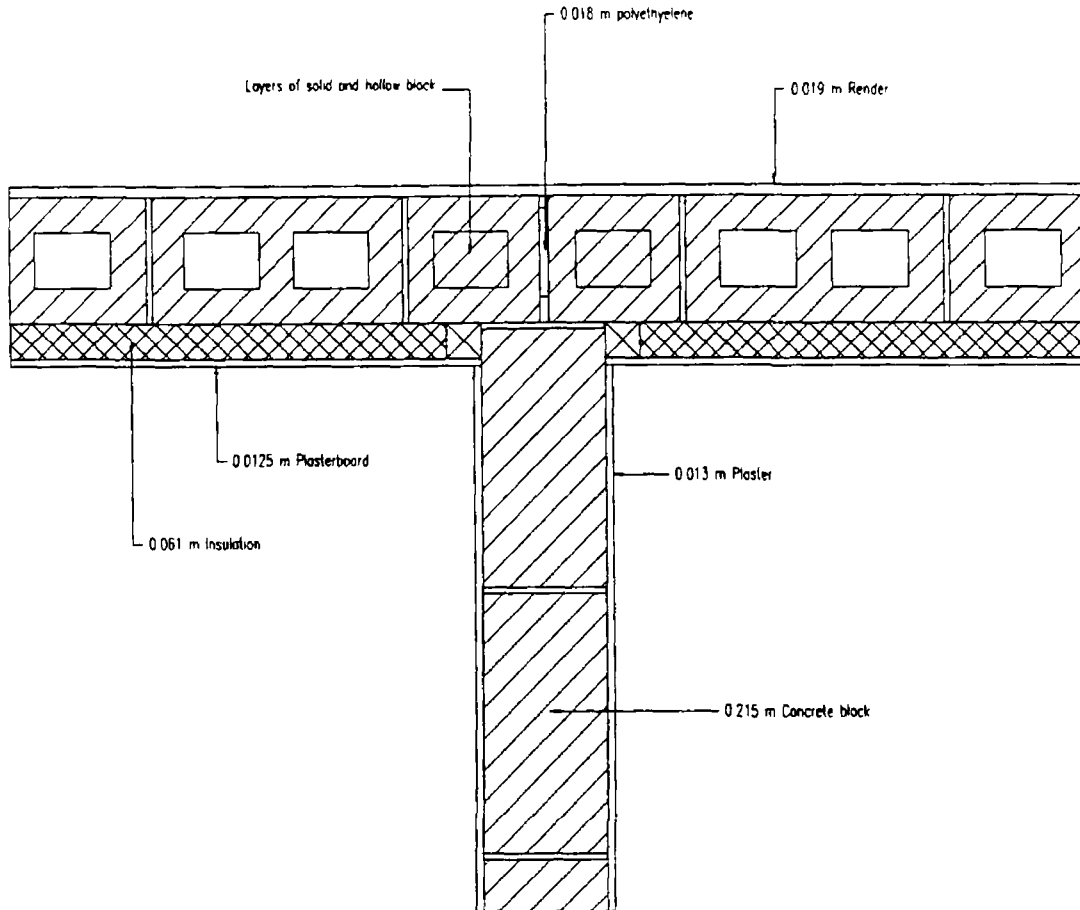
Party Wall of Two Adjoining Semi-Detached Houses
